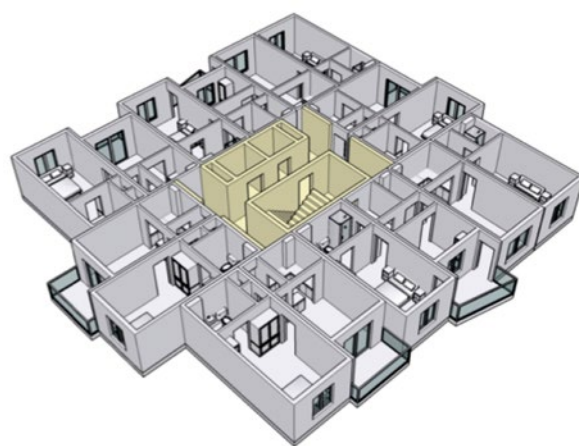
Typical layout of modules in high-rise buildings (courtesy HTA Design)
